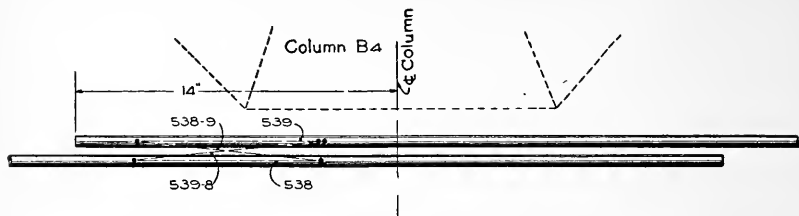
ARRANGEMENT OF GAGE LINES ON WORCESTER TEST FLOOR FOR MEASUREMENT OF SLIP OF BARS.
